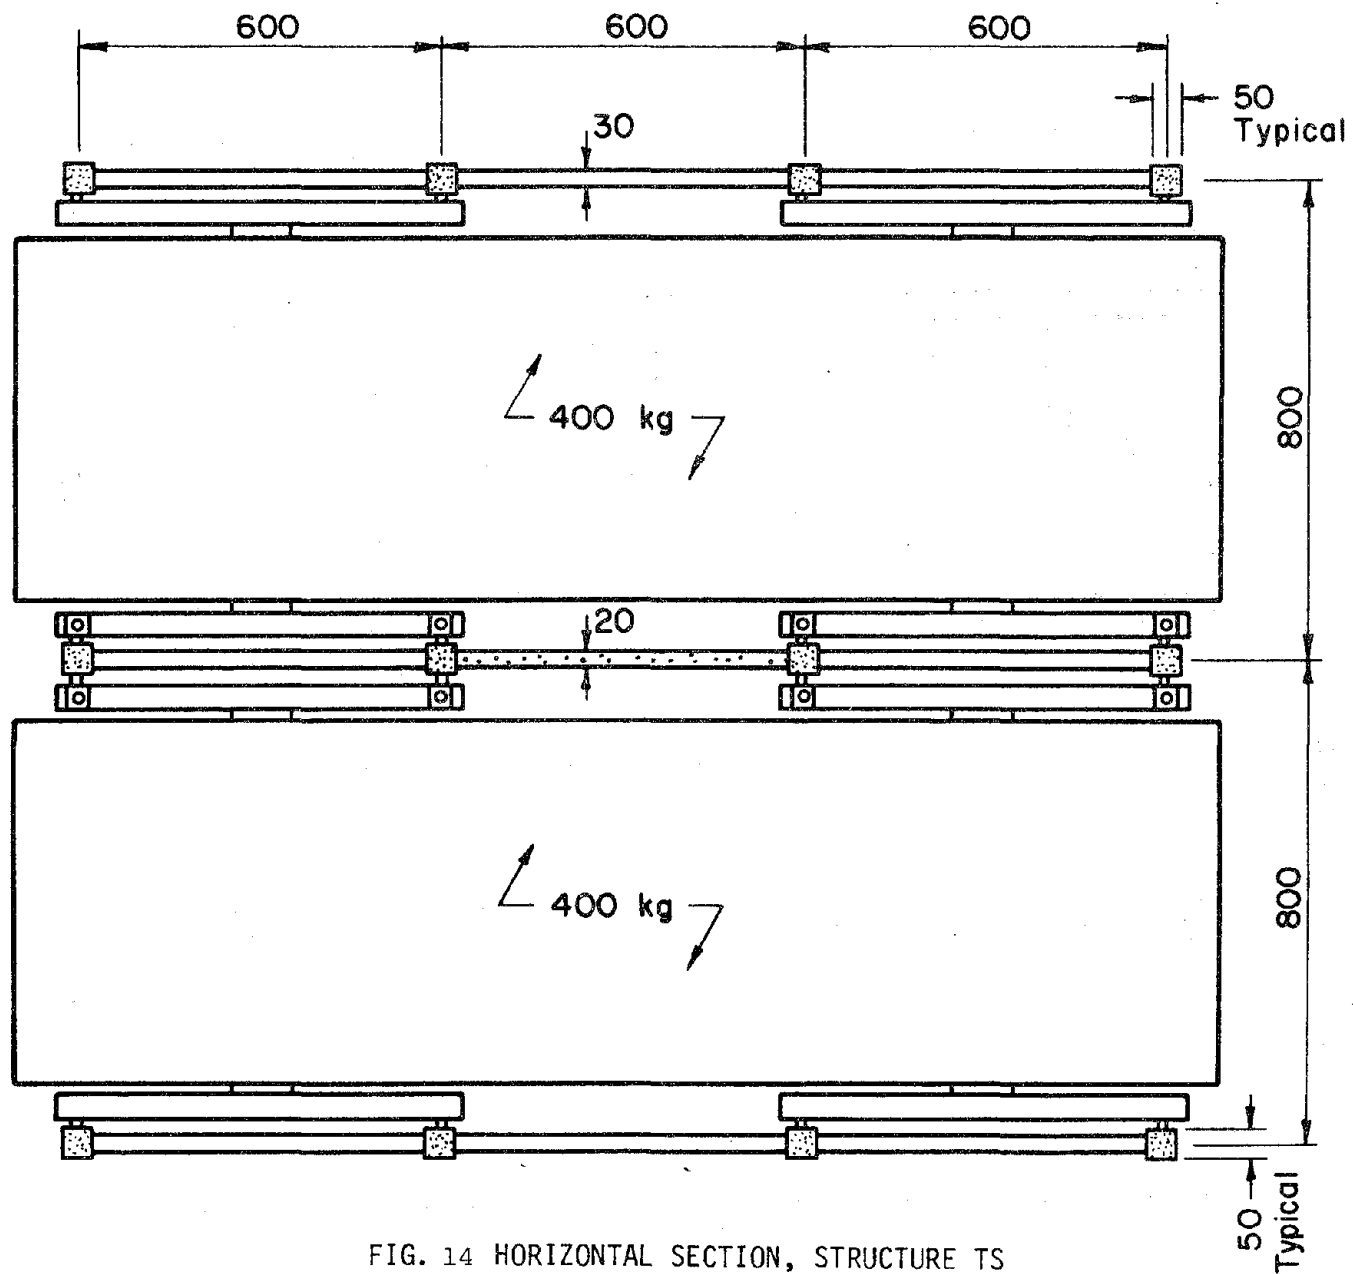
HORIZONTAL SECTION, STRUCTURE TS
